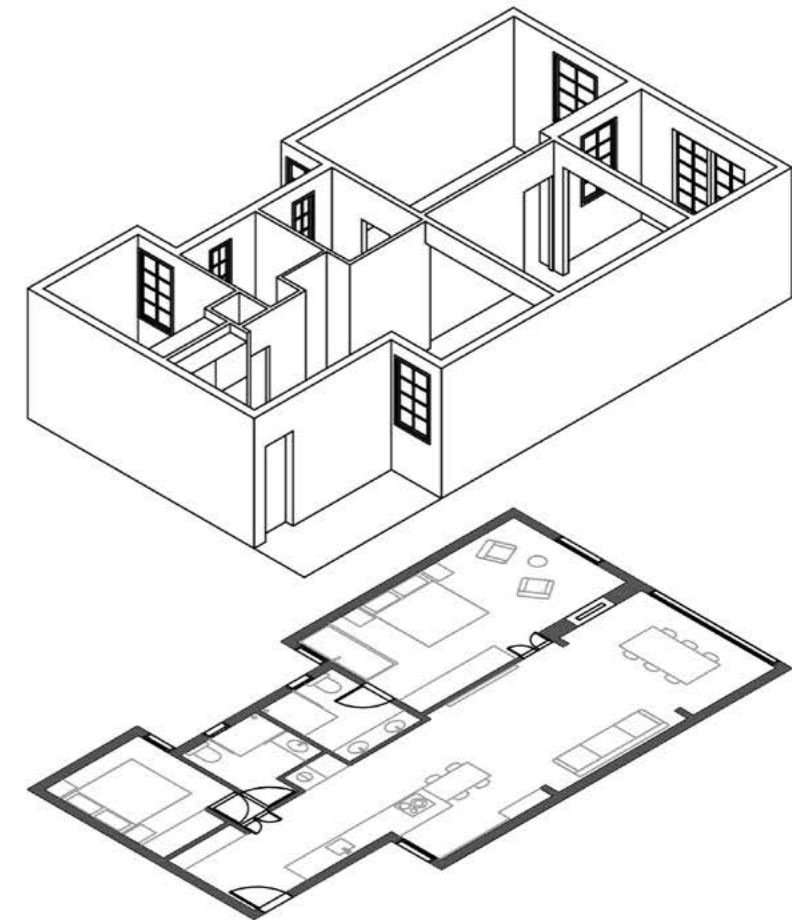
Axonometric of typical two bed apartment located within the Barcelona housing block
